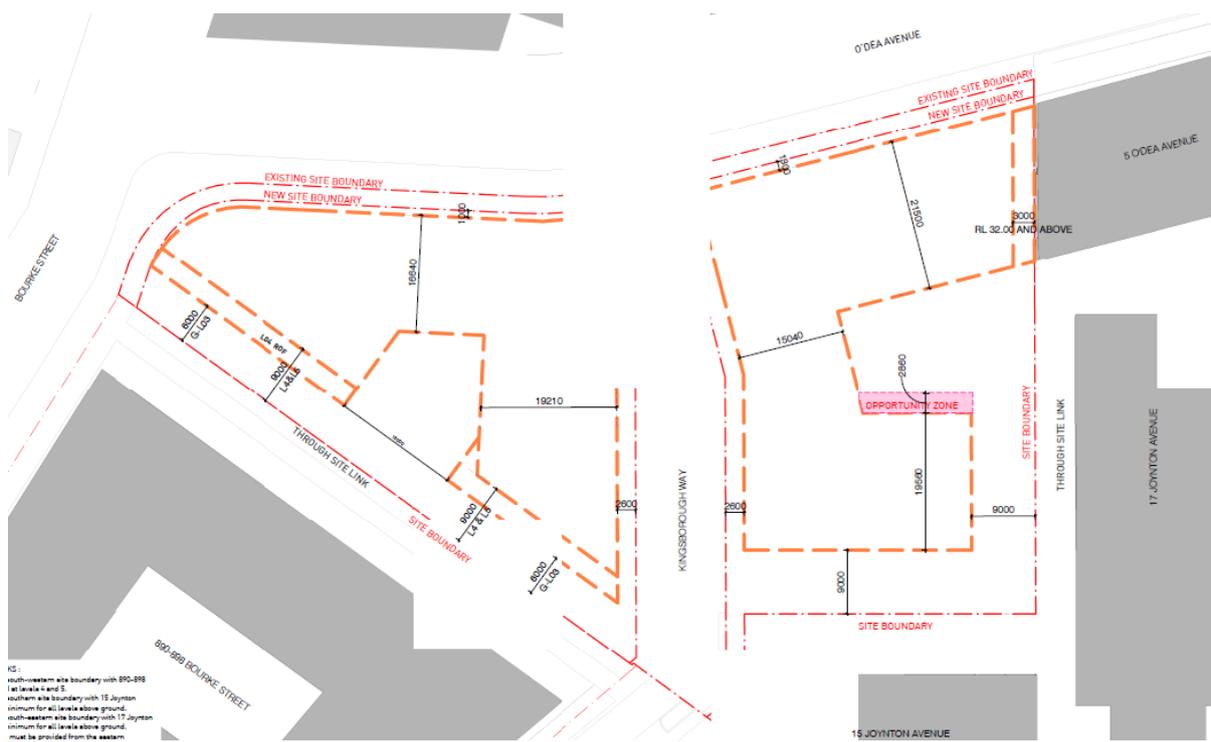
Floor plan depicting all approved setbacks for D/2017/1723
